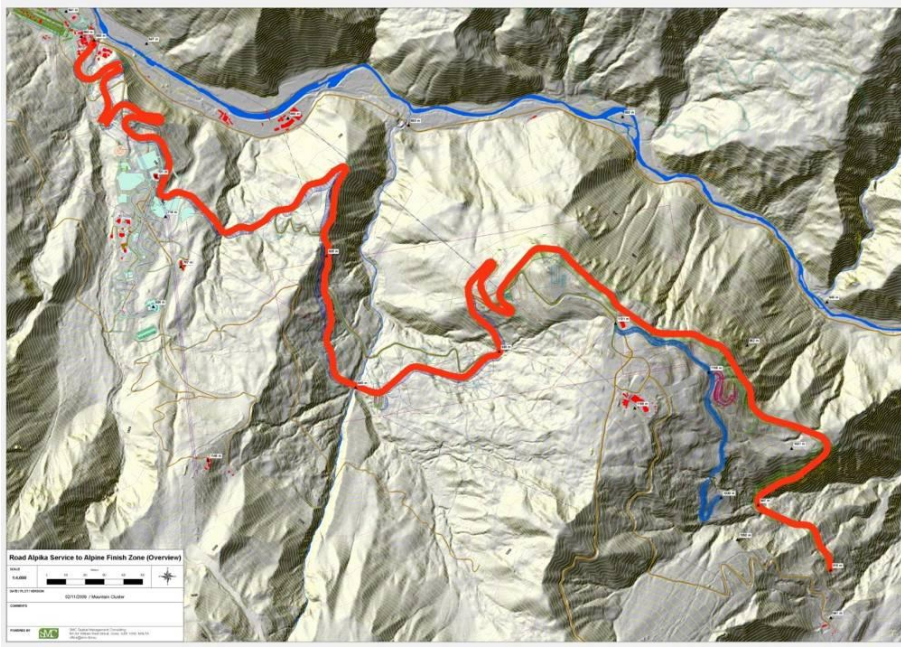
Originally planned road to Mountain Media Village (+960)
